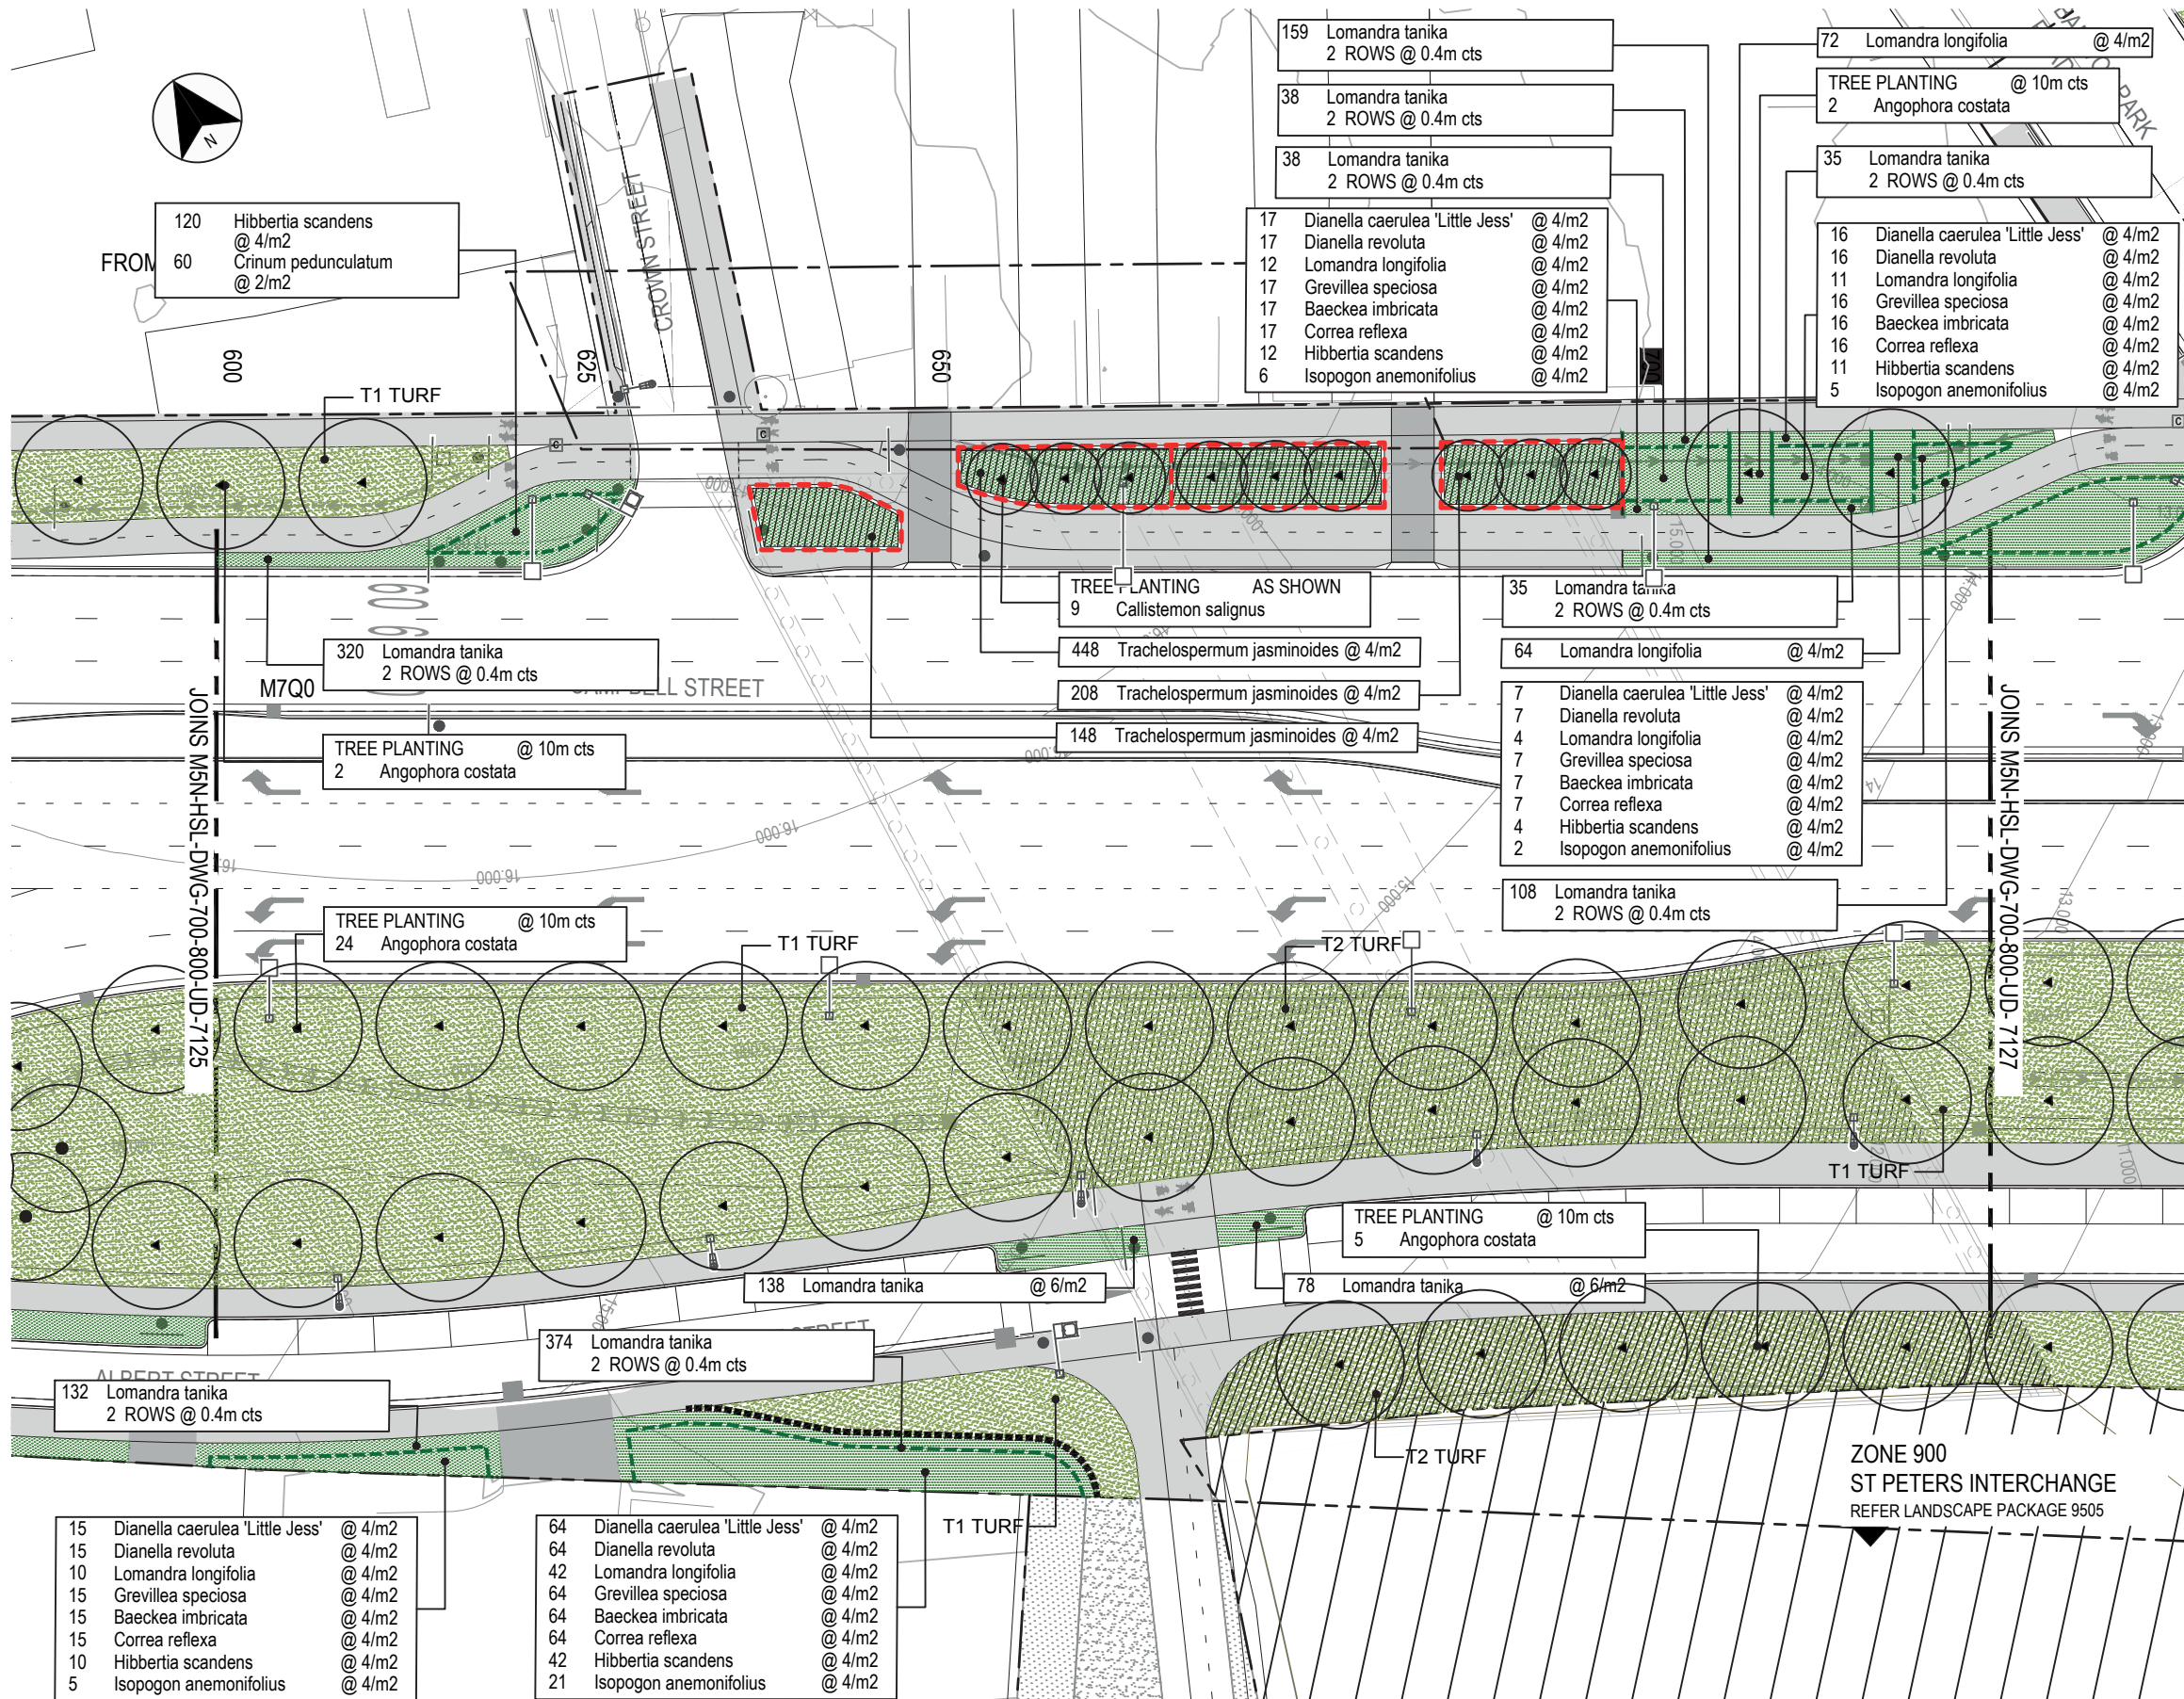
Campbell Street Green Link - Landscape Plans - Sheet 5 of 10
